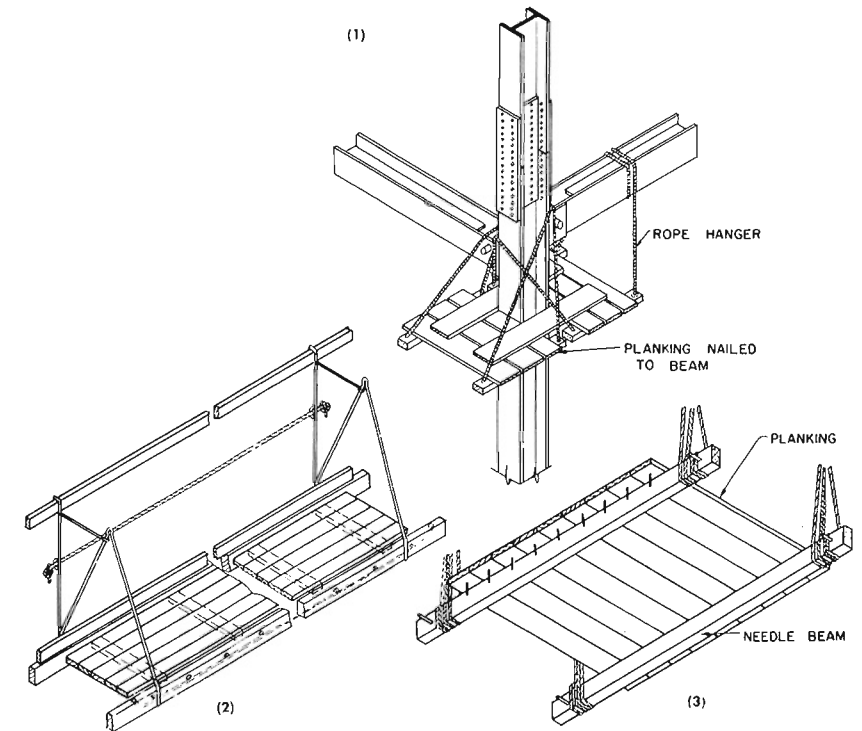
Examples of hanging scaffolds used in bolting and riveting steel bridges.
